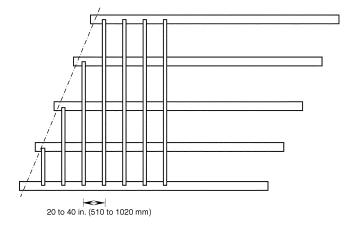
Arrangement of straps near the end support of a skew bridge.
